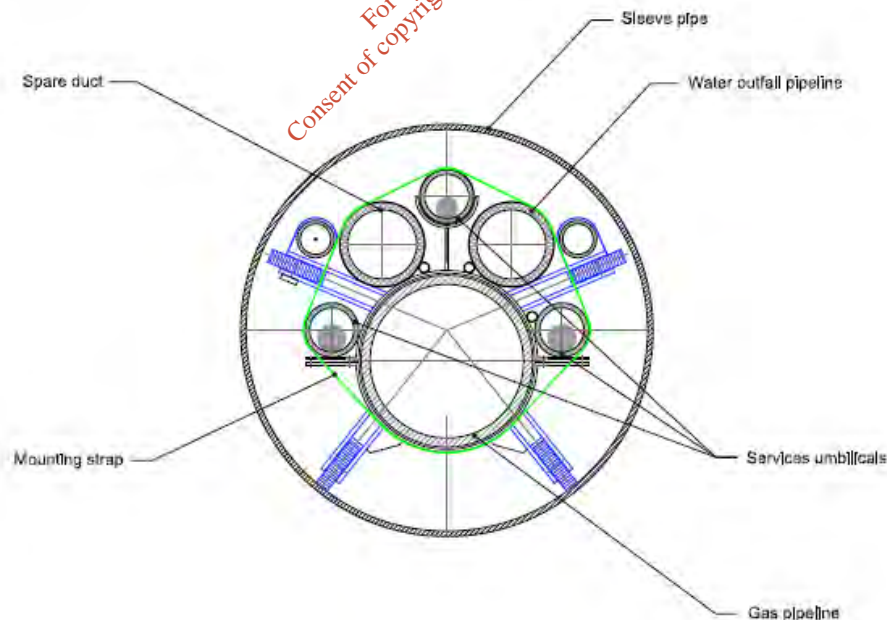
SHOWING GAS PIPE IN BUNDLE ARRANGEMENT INSIDE SLEEVE PIPE
